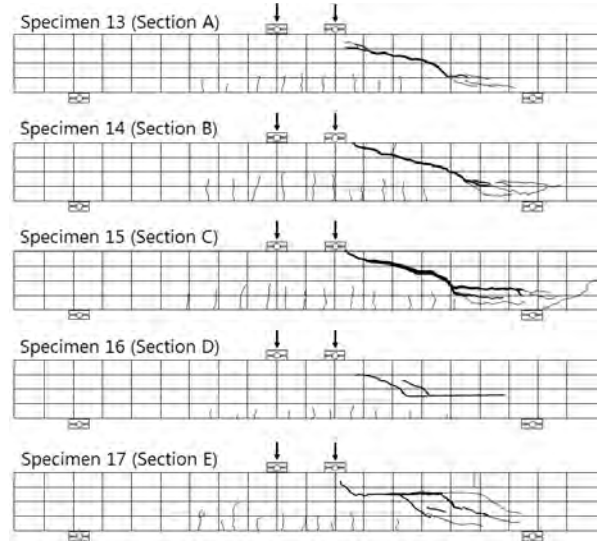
Crack pattern of specimen 13~17 at the end of test
